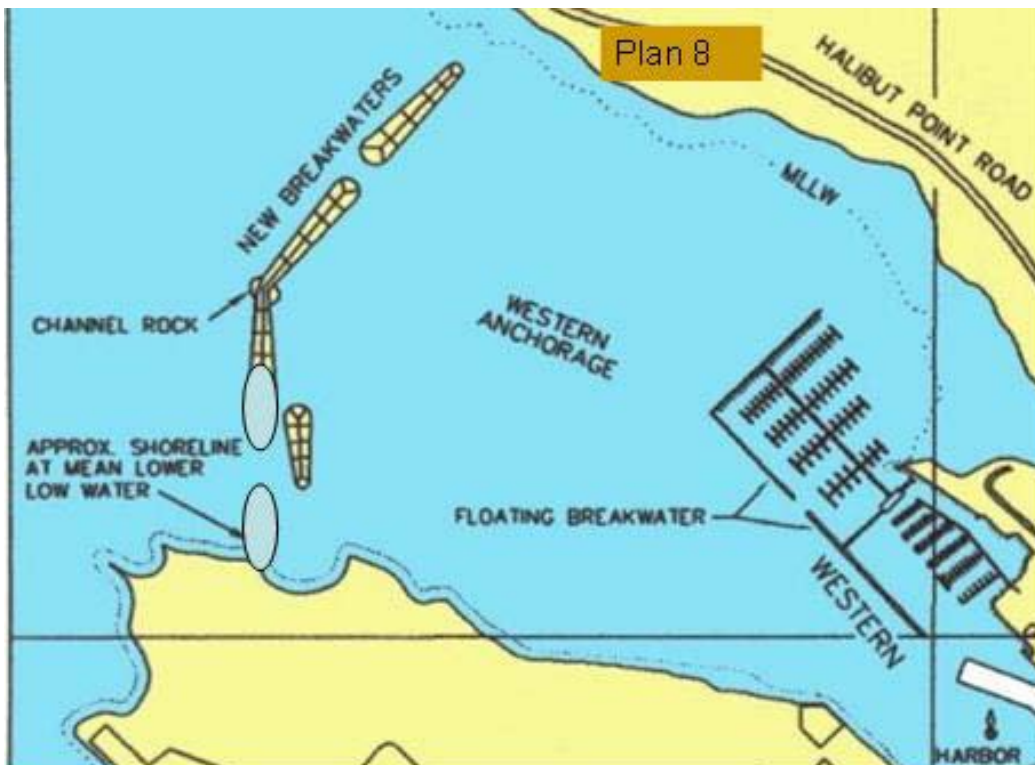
Plan 8 is a combination of Plan 1 and Plan 3.
